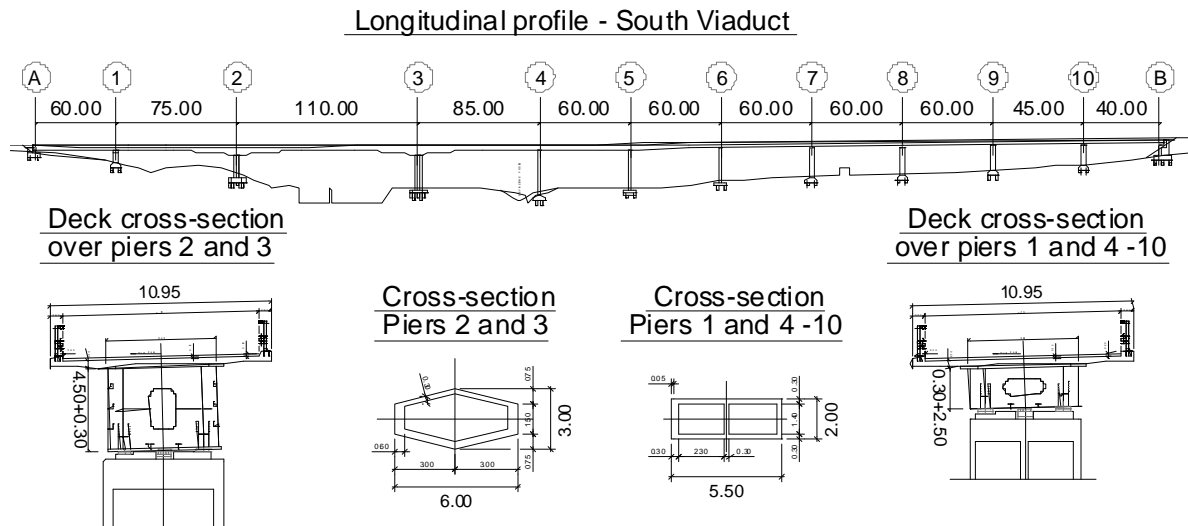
Lordo Viaduct – South viaduct longitudinal profile and cross section of the piers (LESSLOSS, 2004a).
